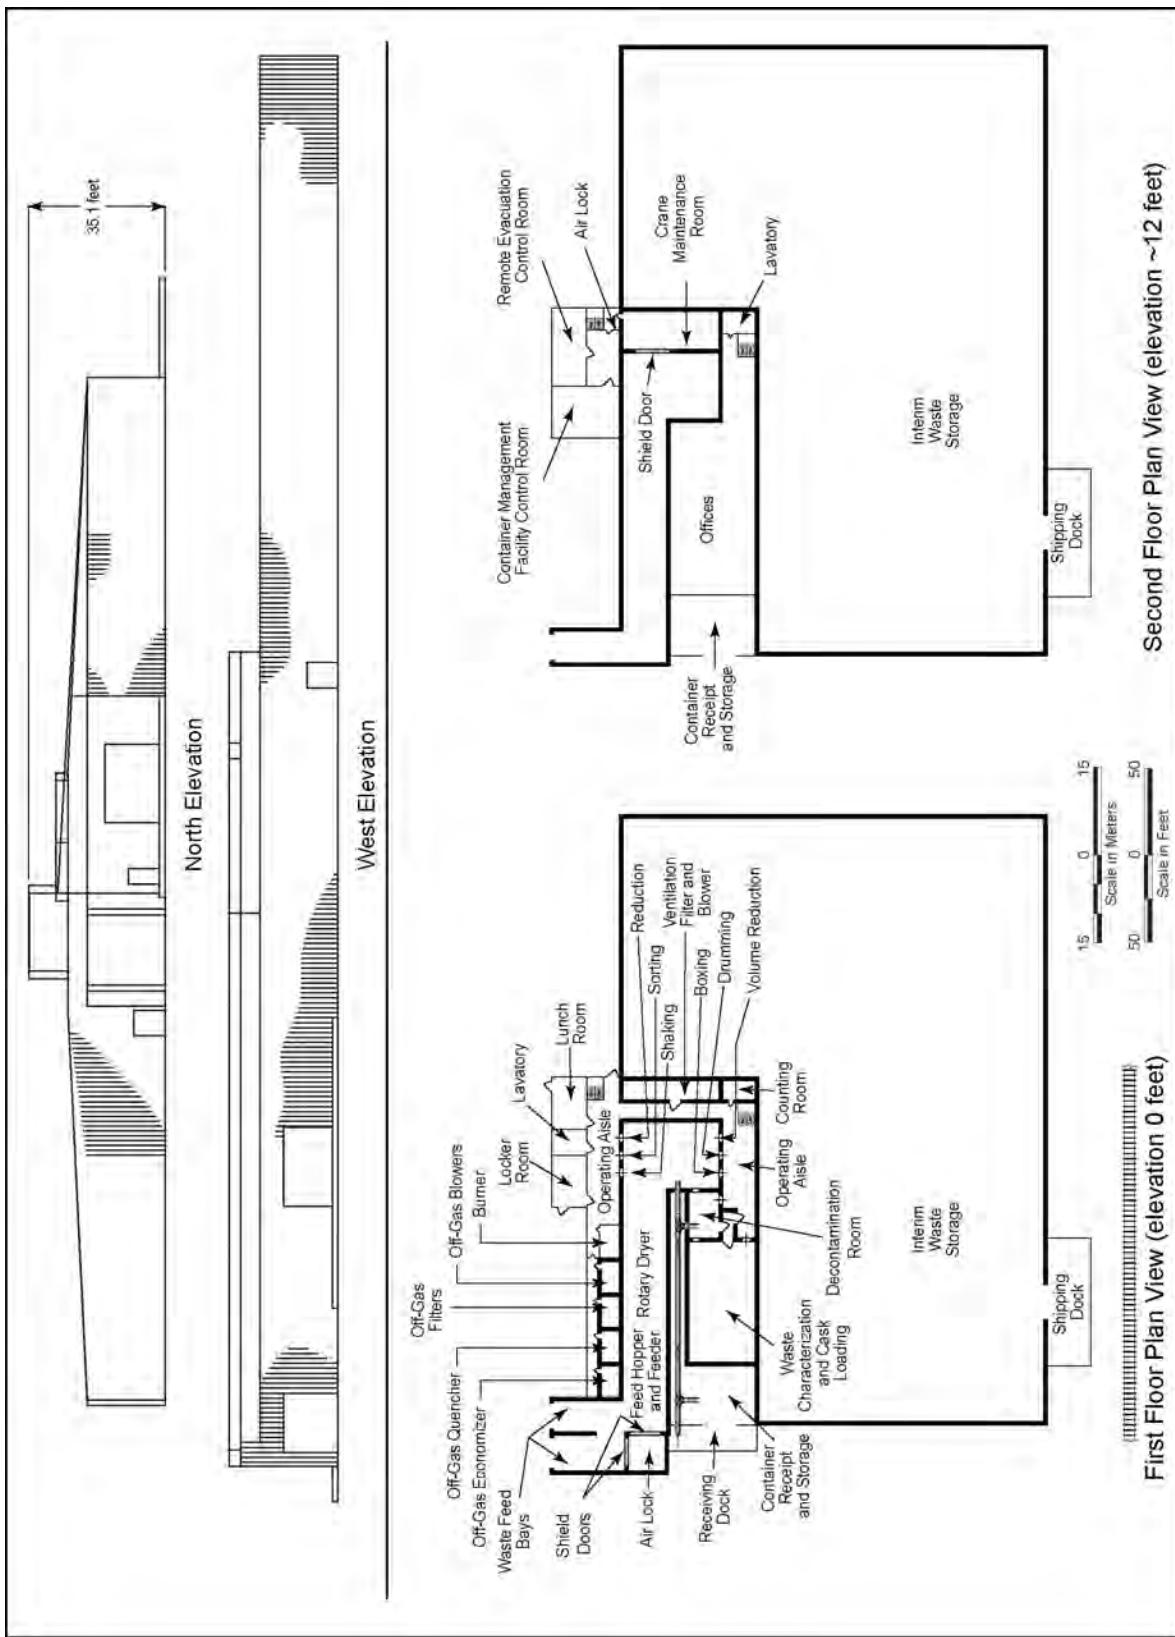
Conceptual Container Management Facility in Waste Management Area 9 – Elevation and Plan View
